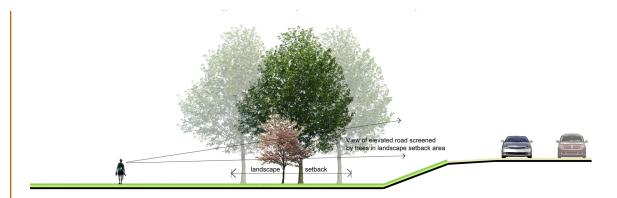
Landscape setback treatment with mainly trees adjacent to an elevated road segment.
